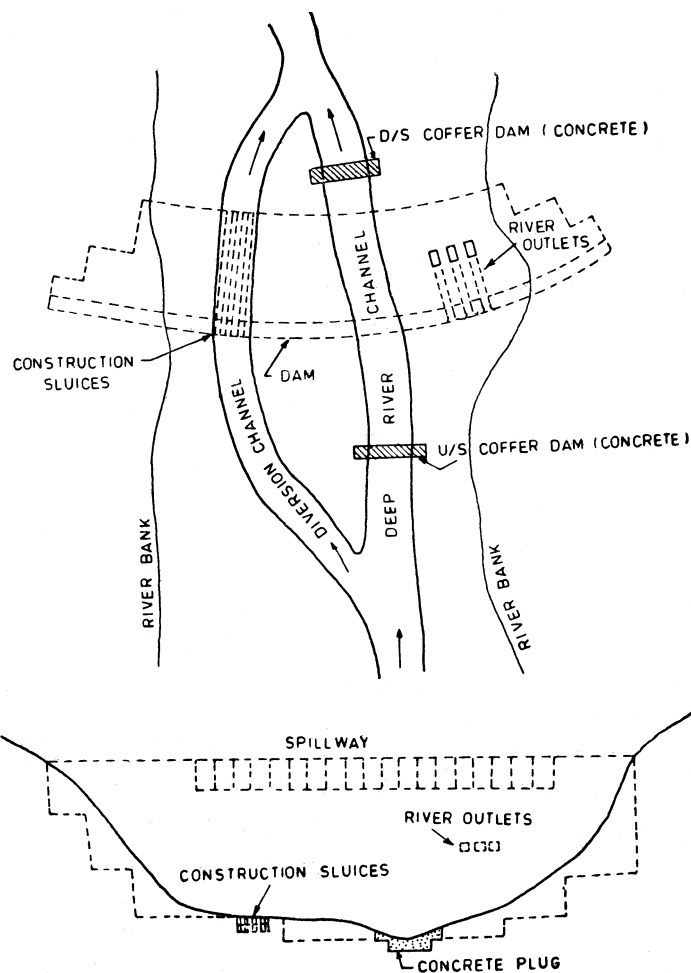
DIVERSION CHANNEL FOR CONCRETE/MASONRY DAM IN A WIDE RIVER
